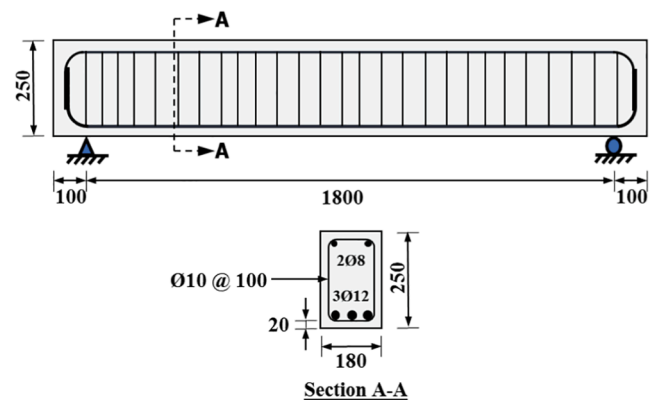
The beams’ geometrical and reinforcement details. All dimensions in mm.
